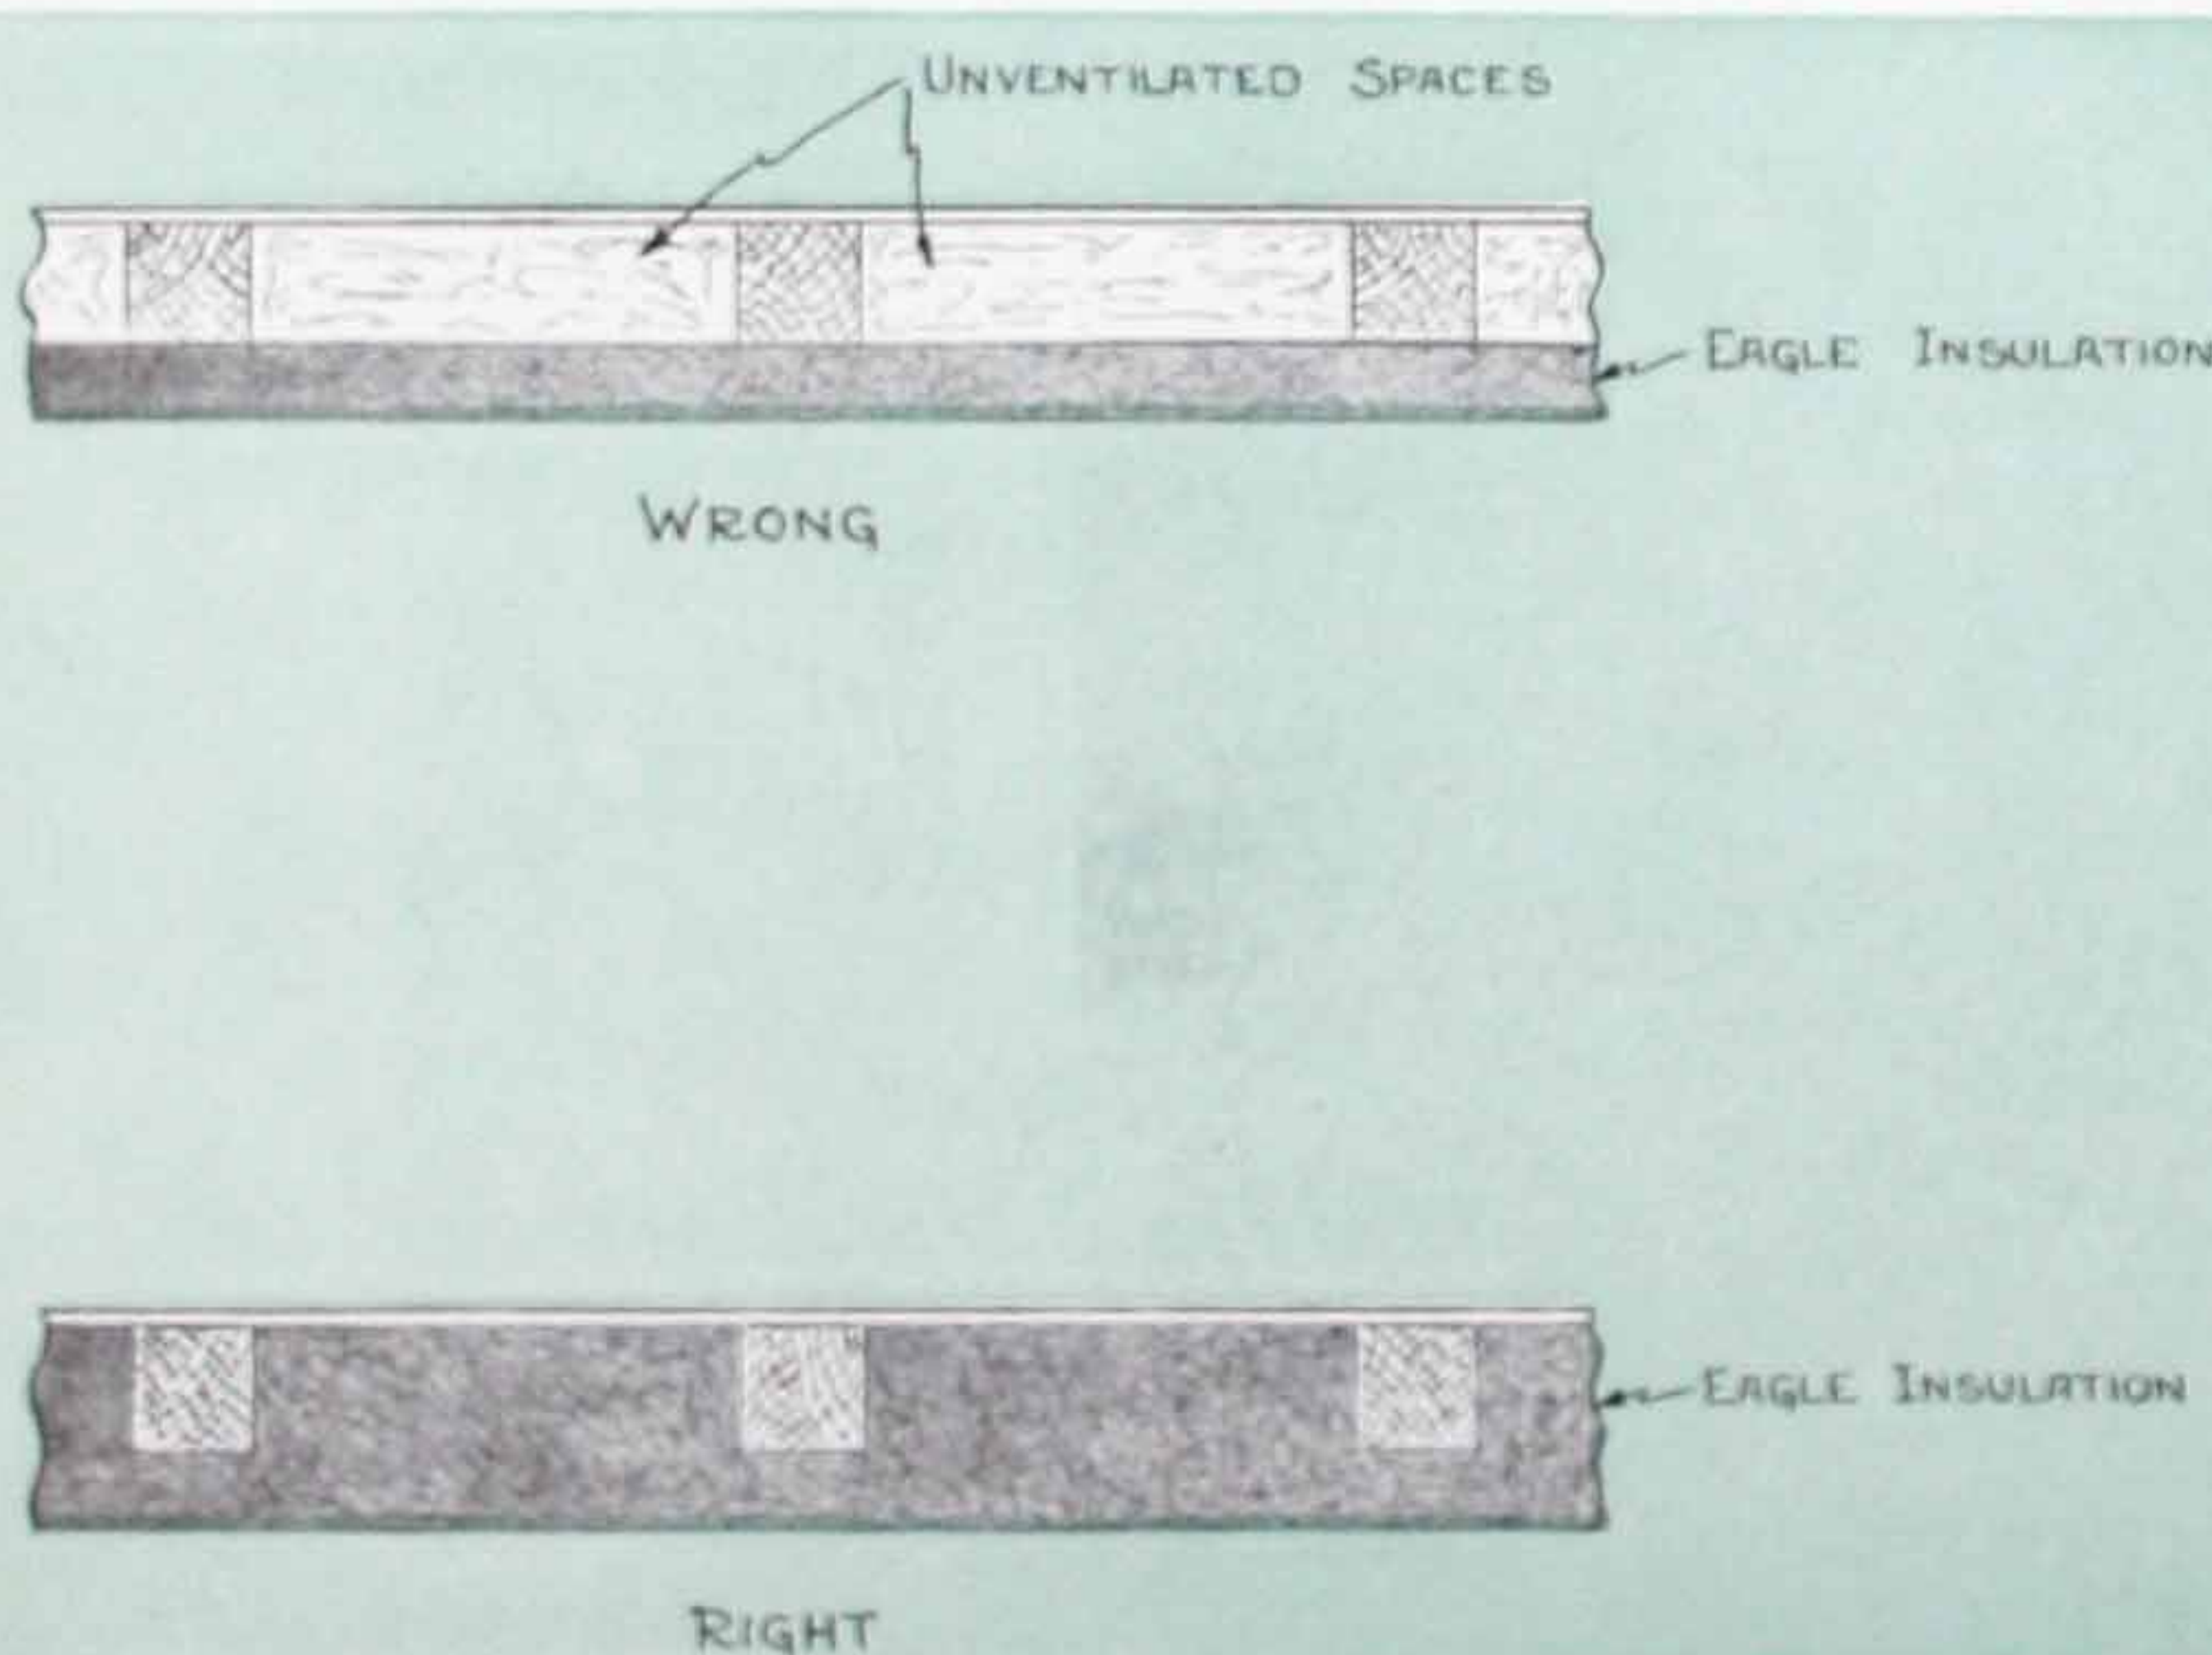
Unventilated spaces should never be left over insulation in ceiling.
